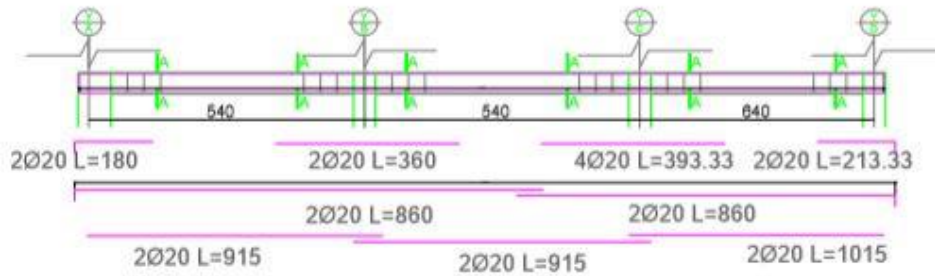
Roof floor beam A-B-C & D on axis 2
